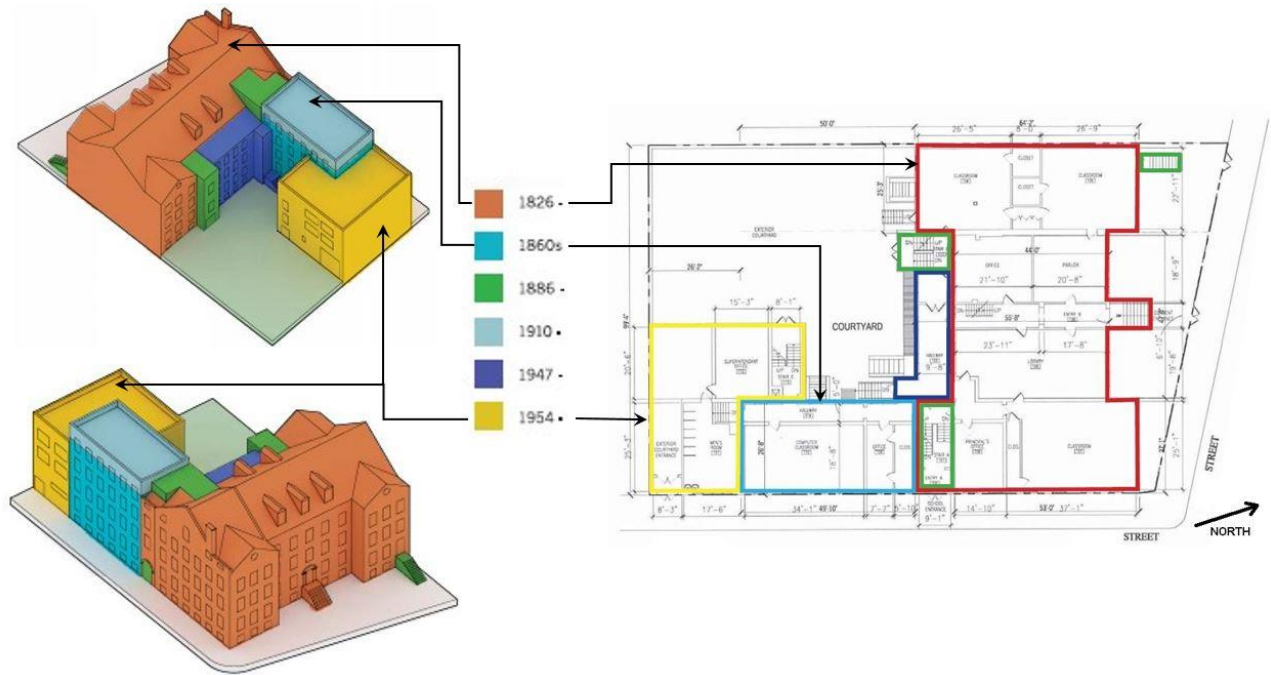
Existing Project Site Plan and Rendering <sup>1</sup>
